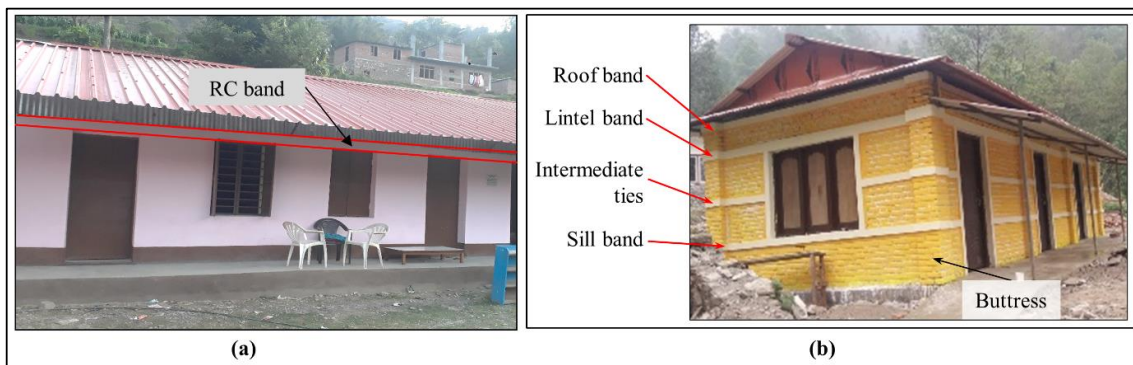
(a) A masonry school building in Nepal retrofitted with a roof band after the 2015 Gorkha earthquake (URM7/LR/MD IB), and (b) A newly built school building in Nepal (URM7/LR/HD).
